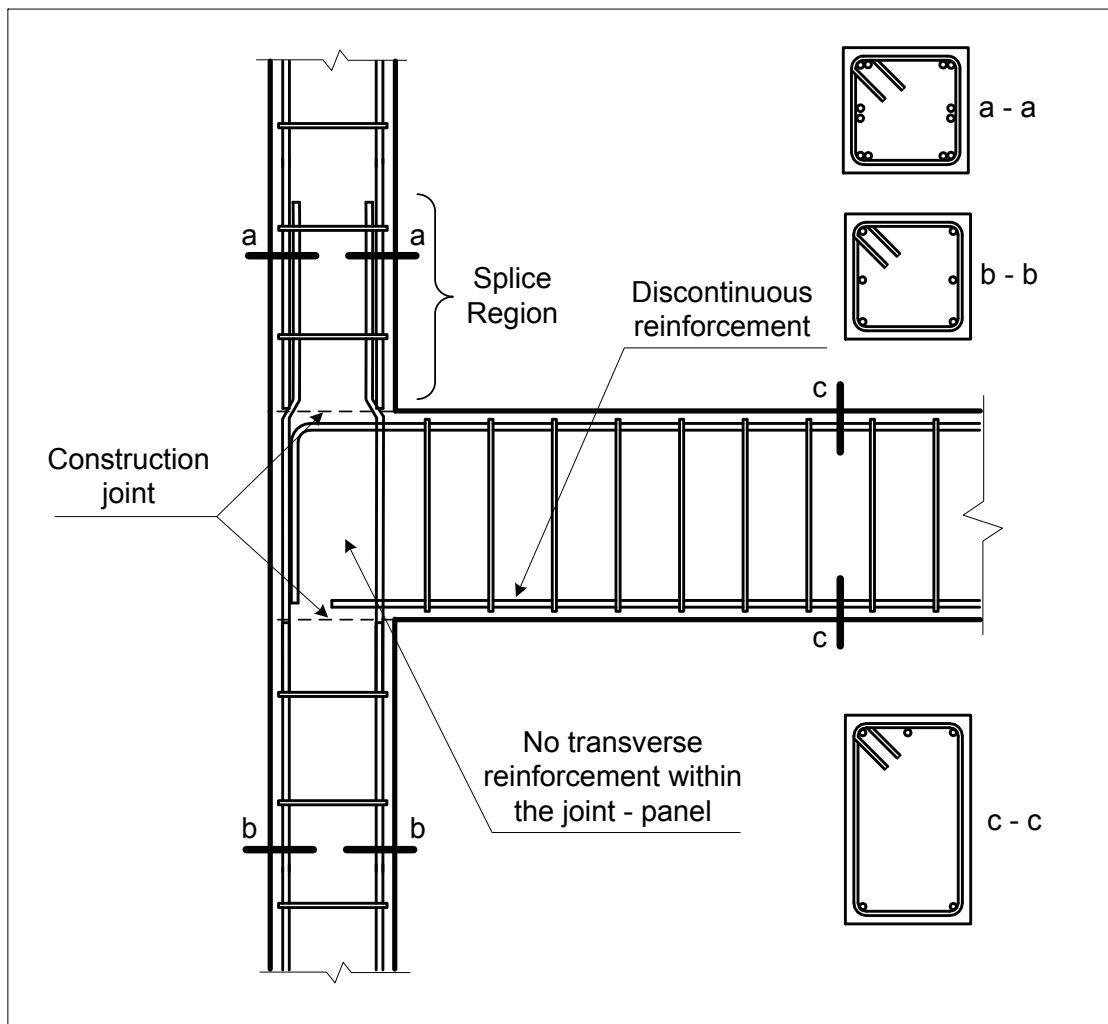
Elevation view of an exterior beam-column connection region [22]
